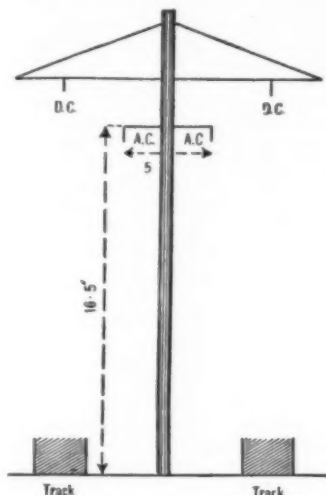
TO ILLUSTRATE COMBINED D.C. AND A.C. EQUIPMENT ON THE BALLSTON-SCHENECTADY LINE.
